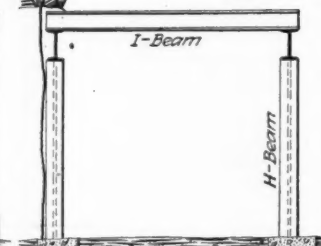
I-BEAM BARS ON I-BEAMS, SUPPORTED BY H-BEAM LEGS
